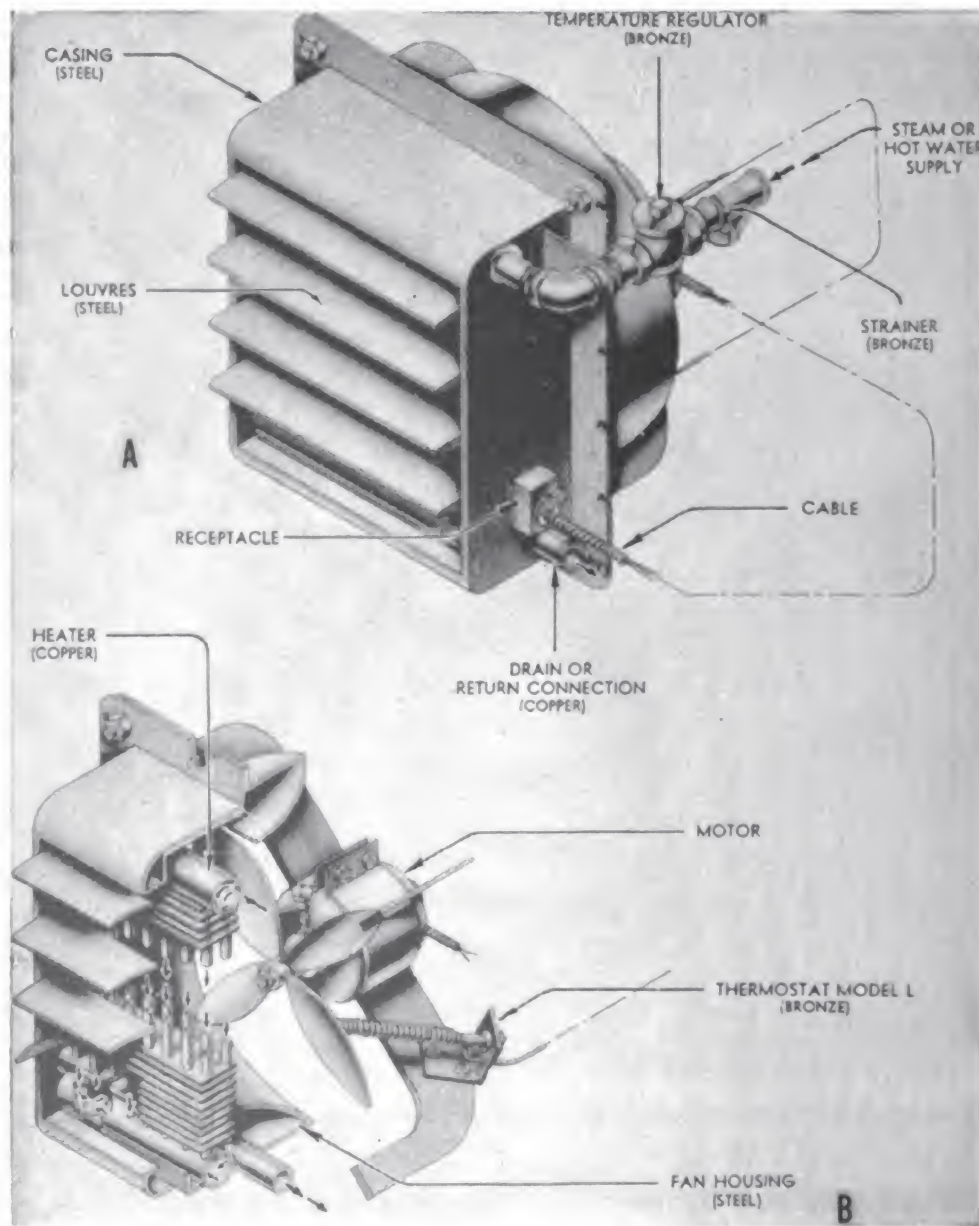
Unit heater: (A) exterior view; (B) cutaway view.
